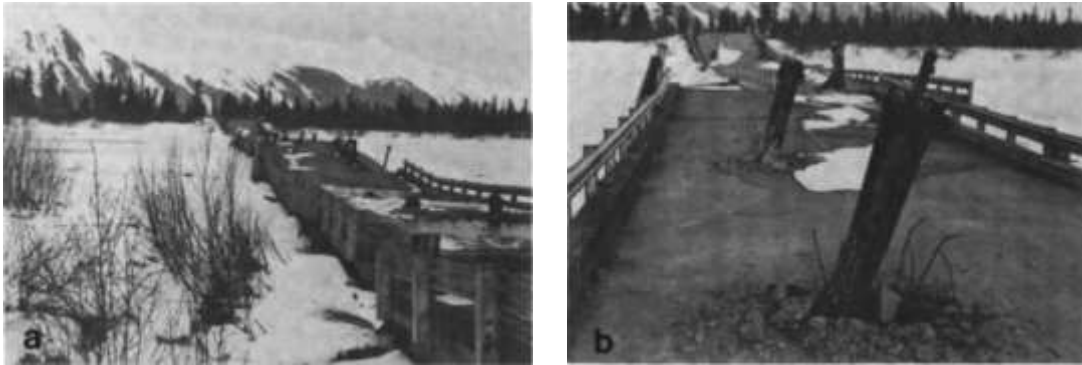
Placer River main crossing. (a) Looking north at bridge; stringers and deck have collapsed to stream-bed, (b) Lateral displacement of superstructure; concrete deck penetrated by timber piles (Ross *et al.*, 1973)
